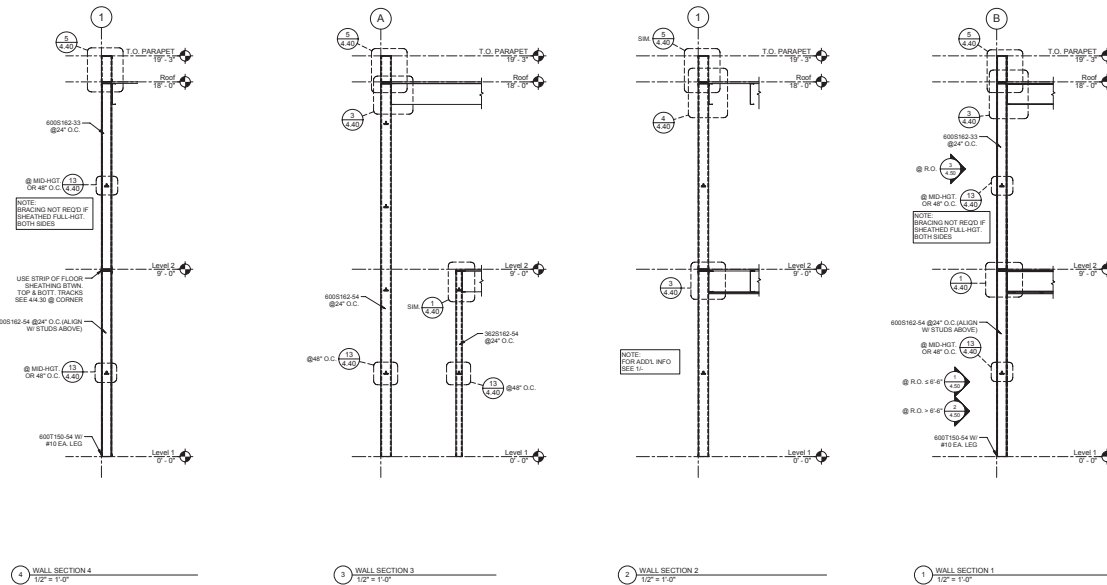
Gravity wall elevation drawings for Phase 1 building specimen
